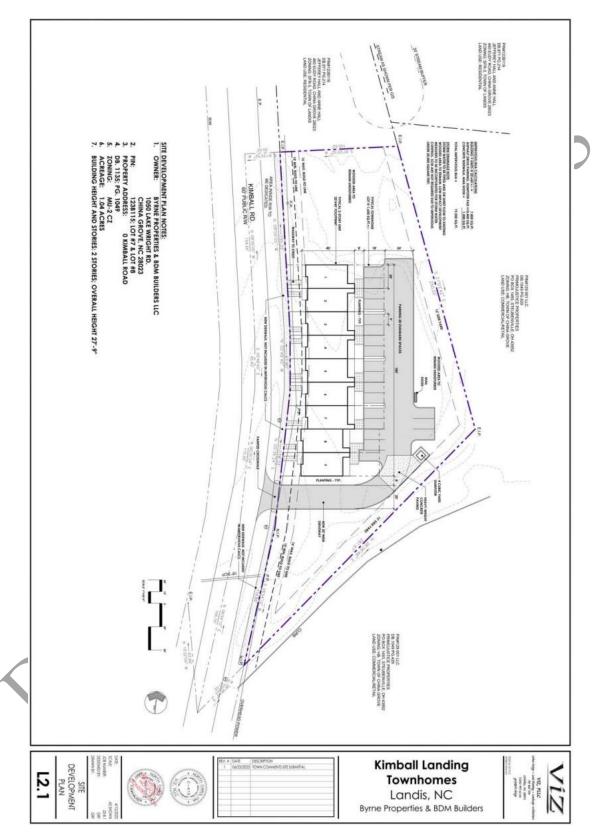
EXHIBIT B - SITE DEVELOPMENT PLAN – SHEET 1
